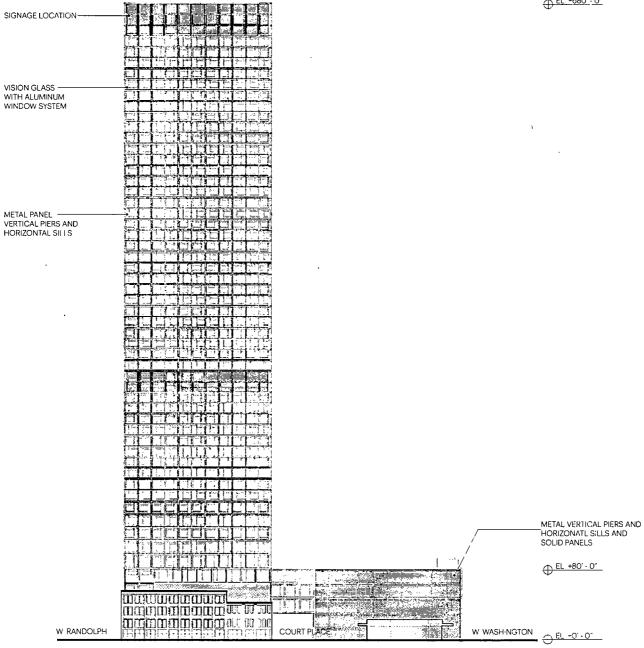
C: EAST TOWER ELEVATION
